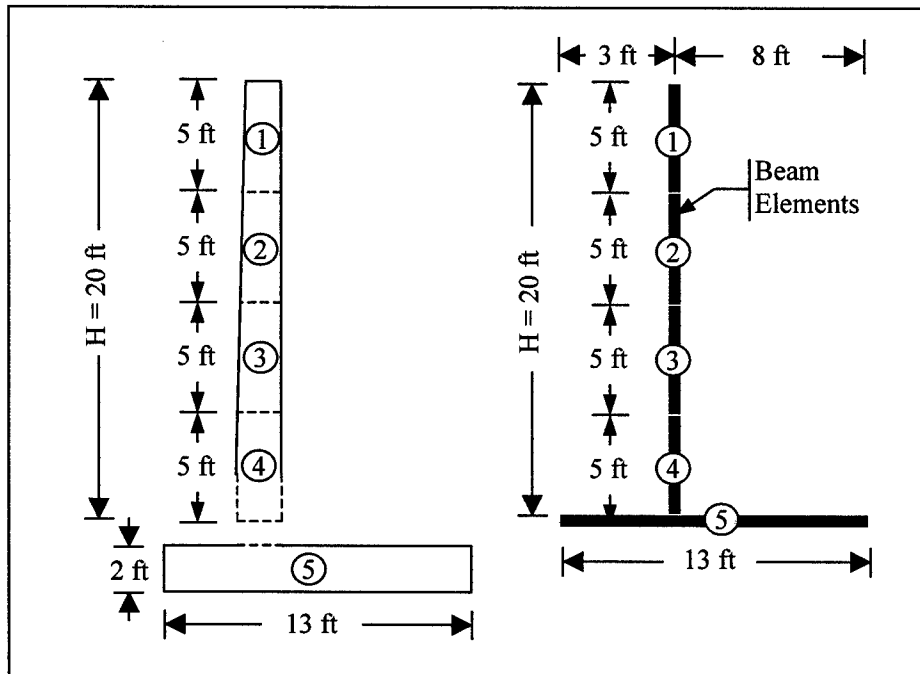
Subdivision of the cantilever wall into five segments, each having constant material properties (To convert feet to meters, multiply by 0.3048)
